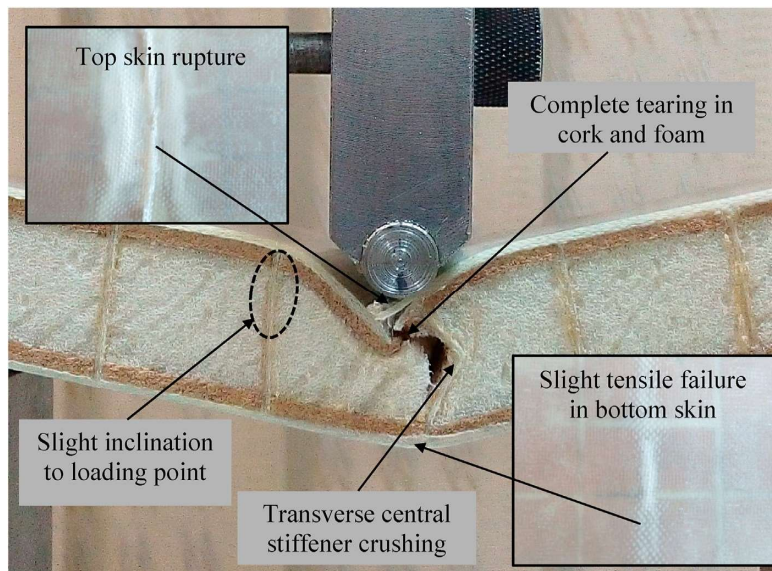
Failure modes in SP2 specimen under the 3 PB test.
